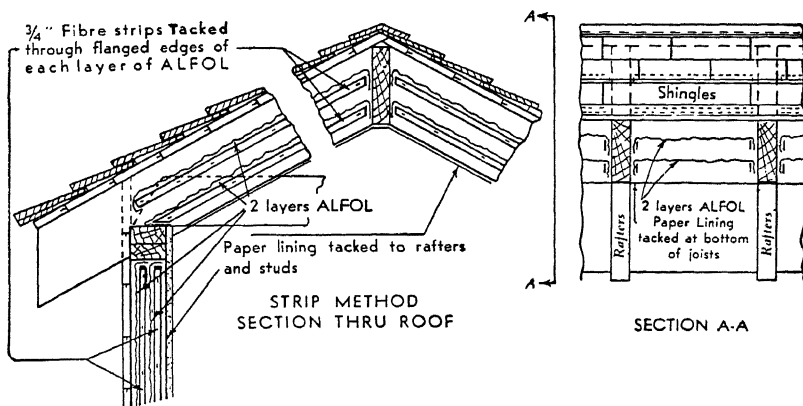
Roof Sections Showing Applications of Aluminum Foil Insulation
